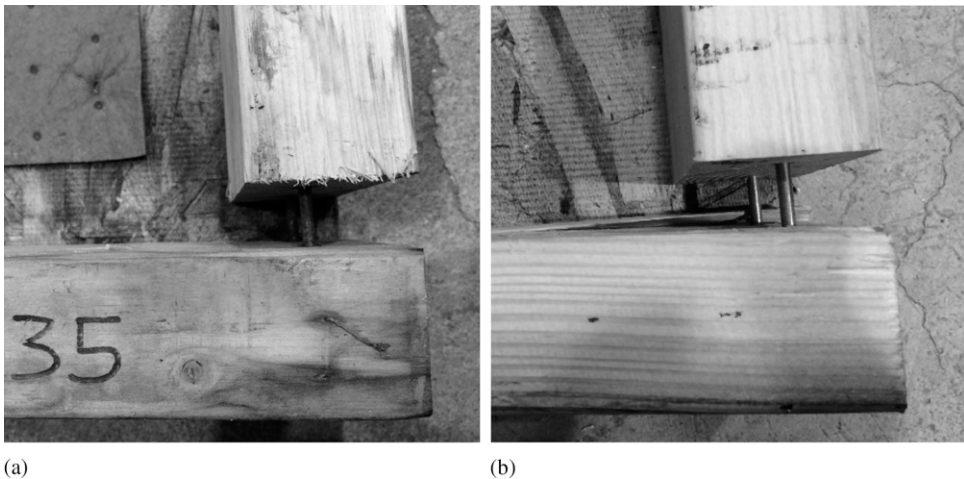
Examples: (a) wetted assembly with corroded framing nails, (b) dry control shear wall with noncorroded framing nails.
